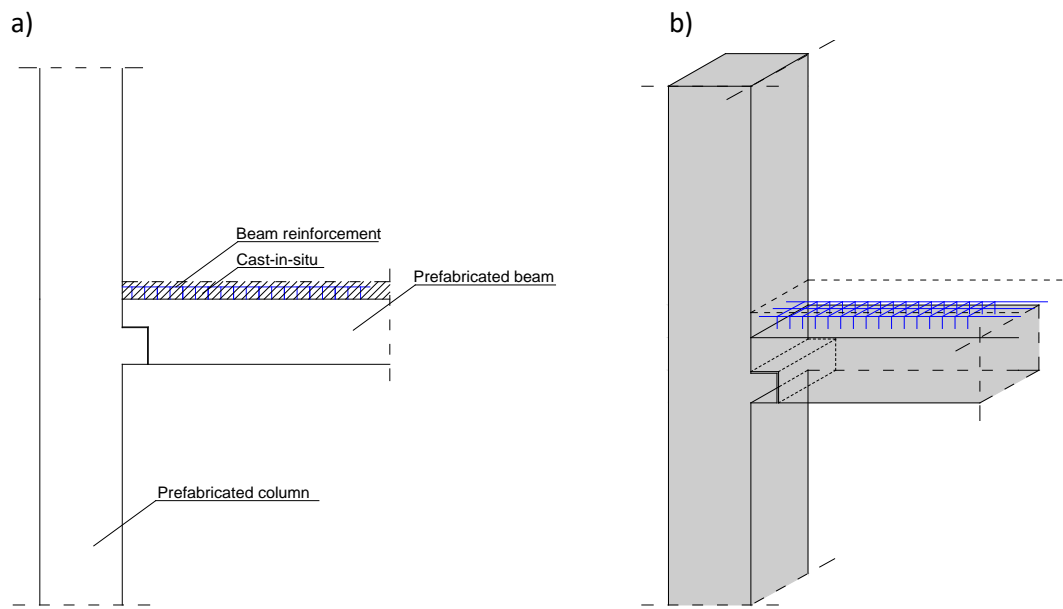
Typical example of partially cast-in-situ beam-to-column fixed (moment resisting) connection.
